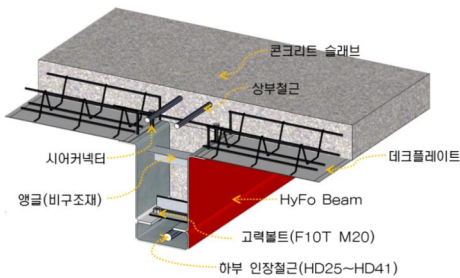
U-shape Hybrid Composite Beam with Concrete Slab
